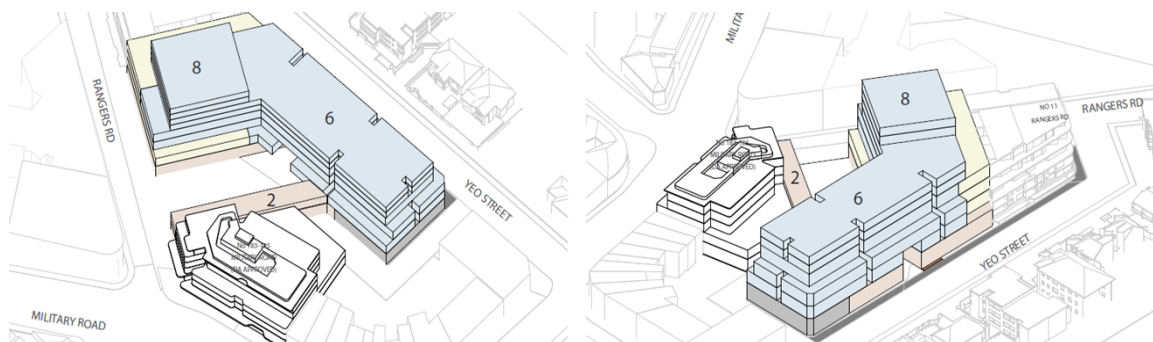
Proposed built form - PP1/23 (Applicant's Urban Design Report)
